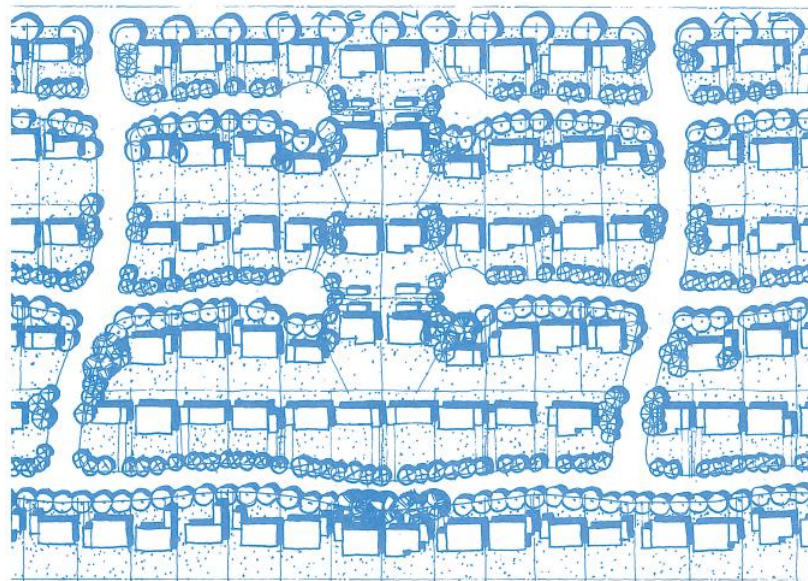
Example of a site plan for residential subdivision to maximise solar access (Morley, 2014)
